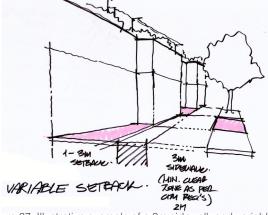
Illustrative example of a 3m sidewalk and variable building setback
